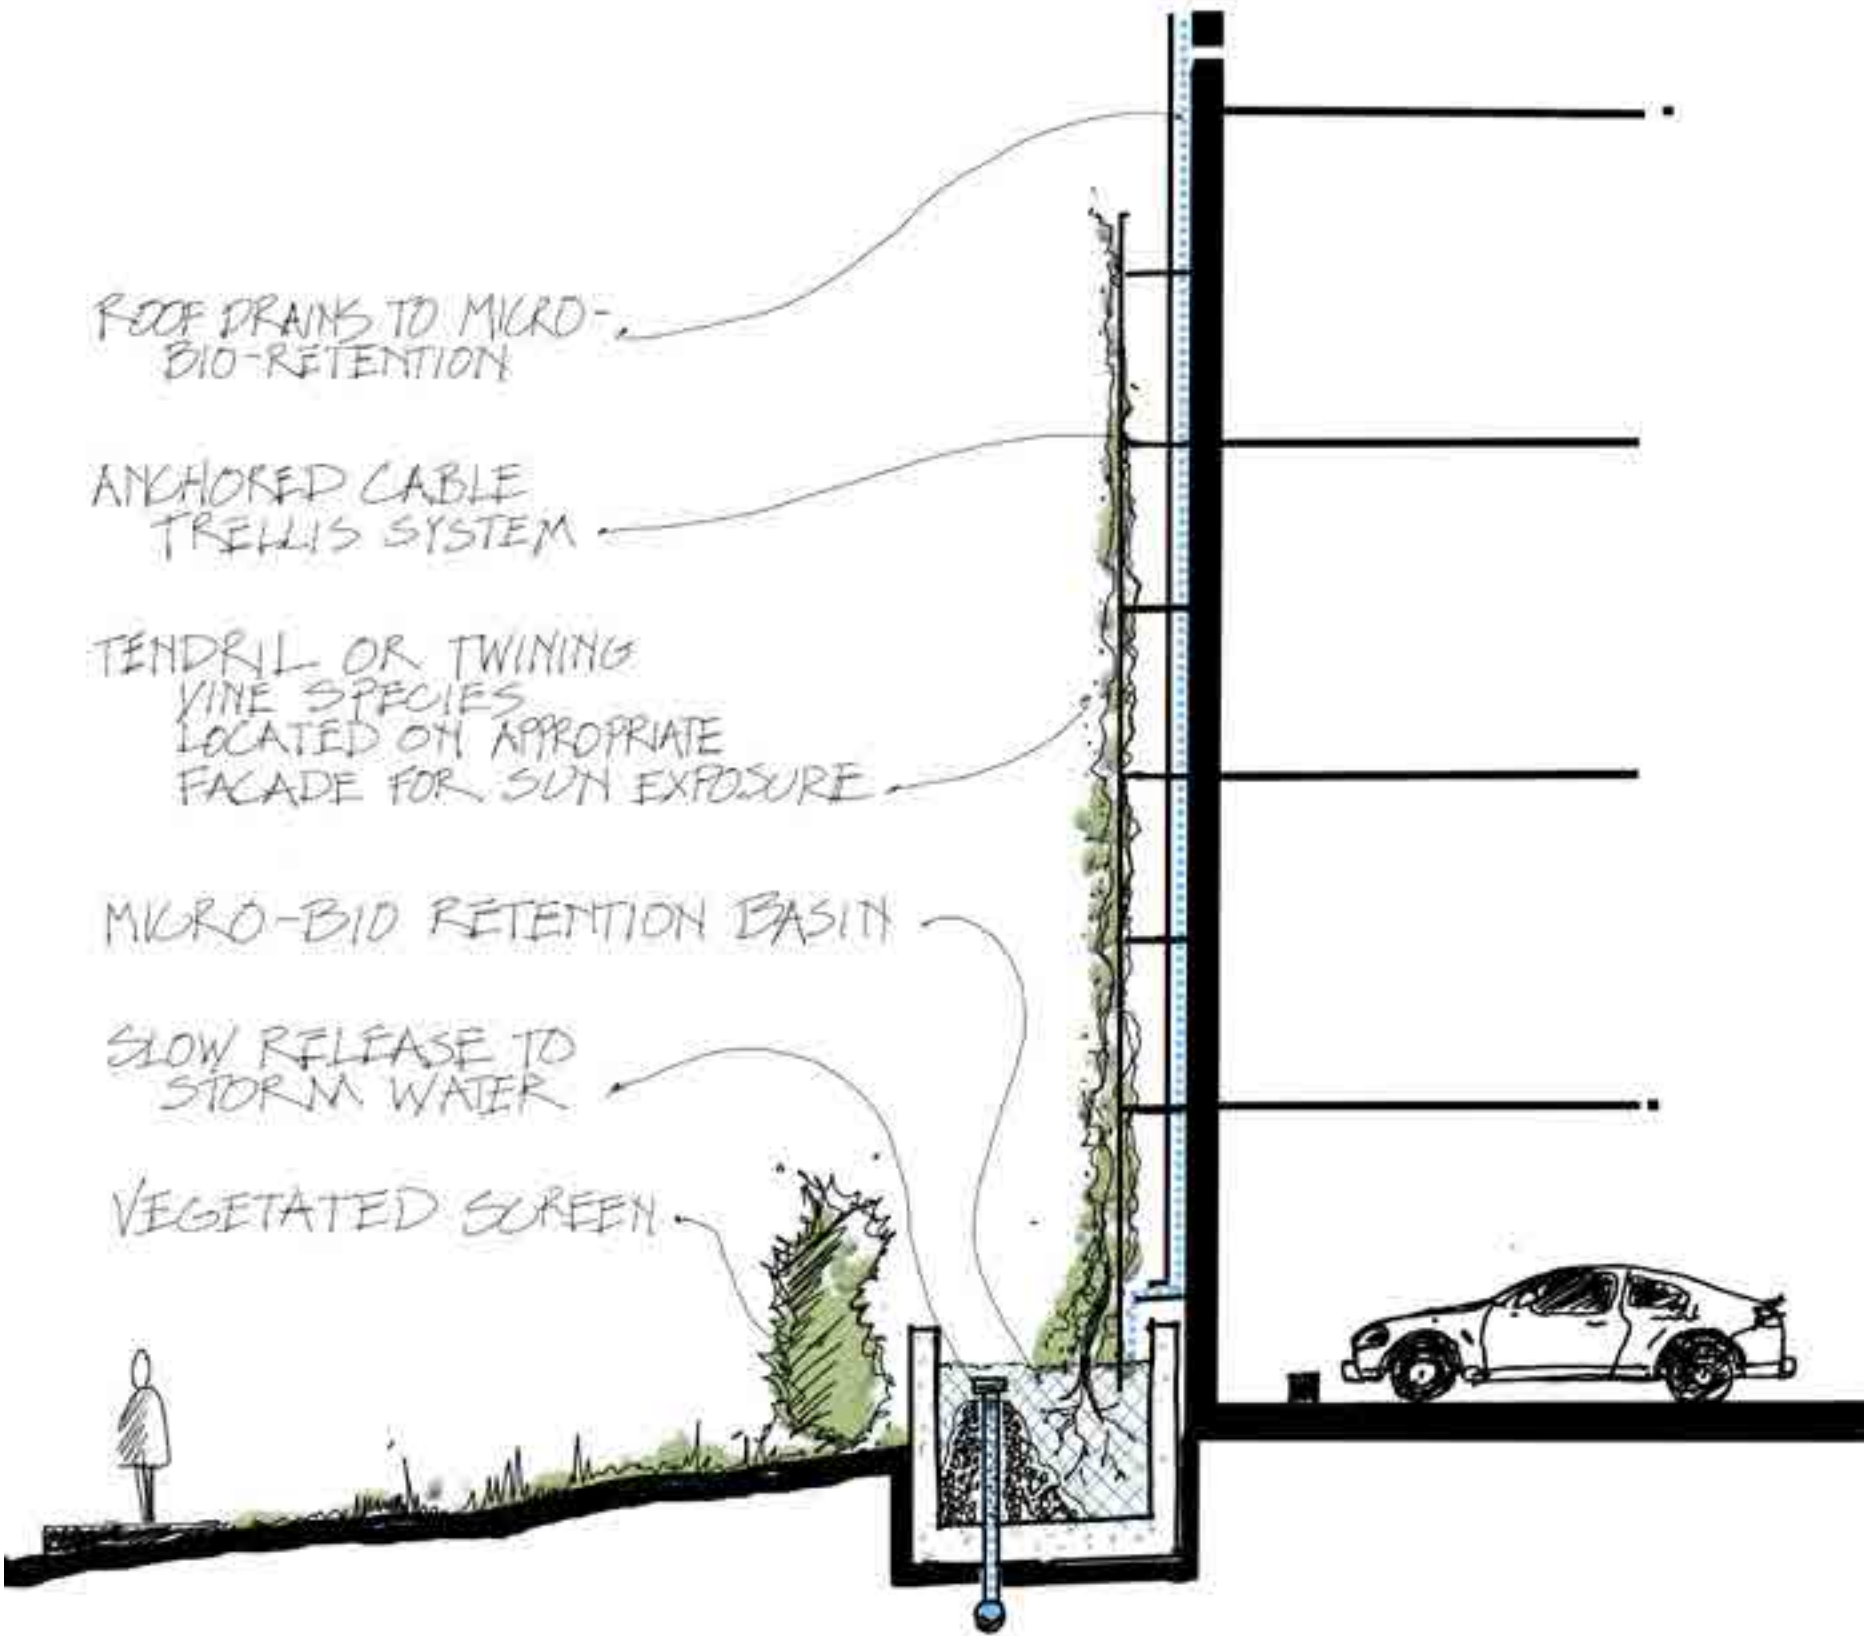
Green wall and micro-bioretention strategy at parking garages
